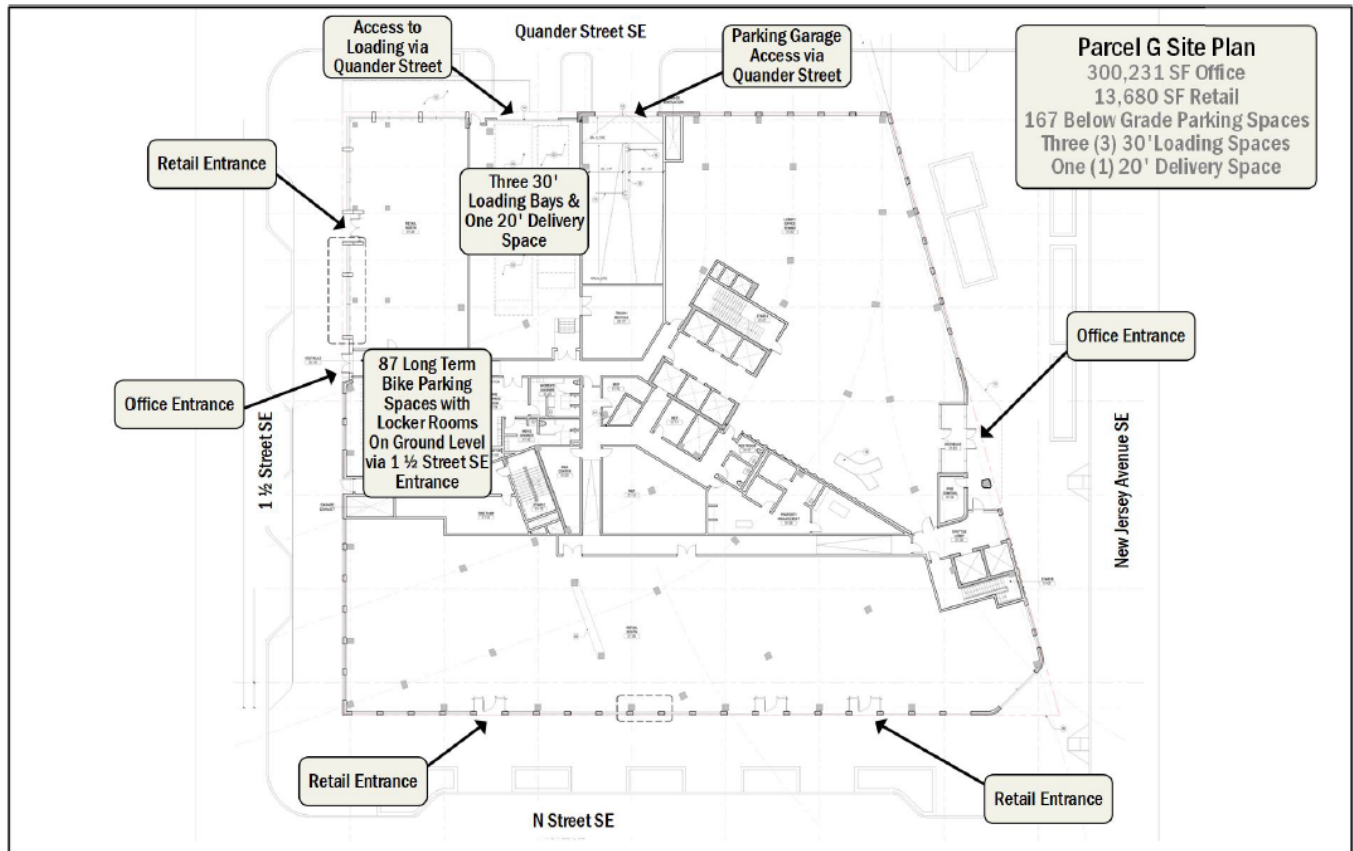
Site Plan (Source: CTR, Grove/Slade, Figure 7, 3/25/19)
